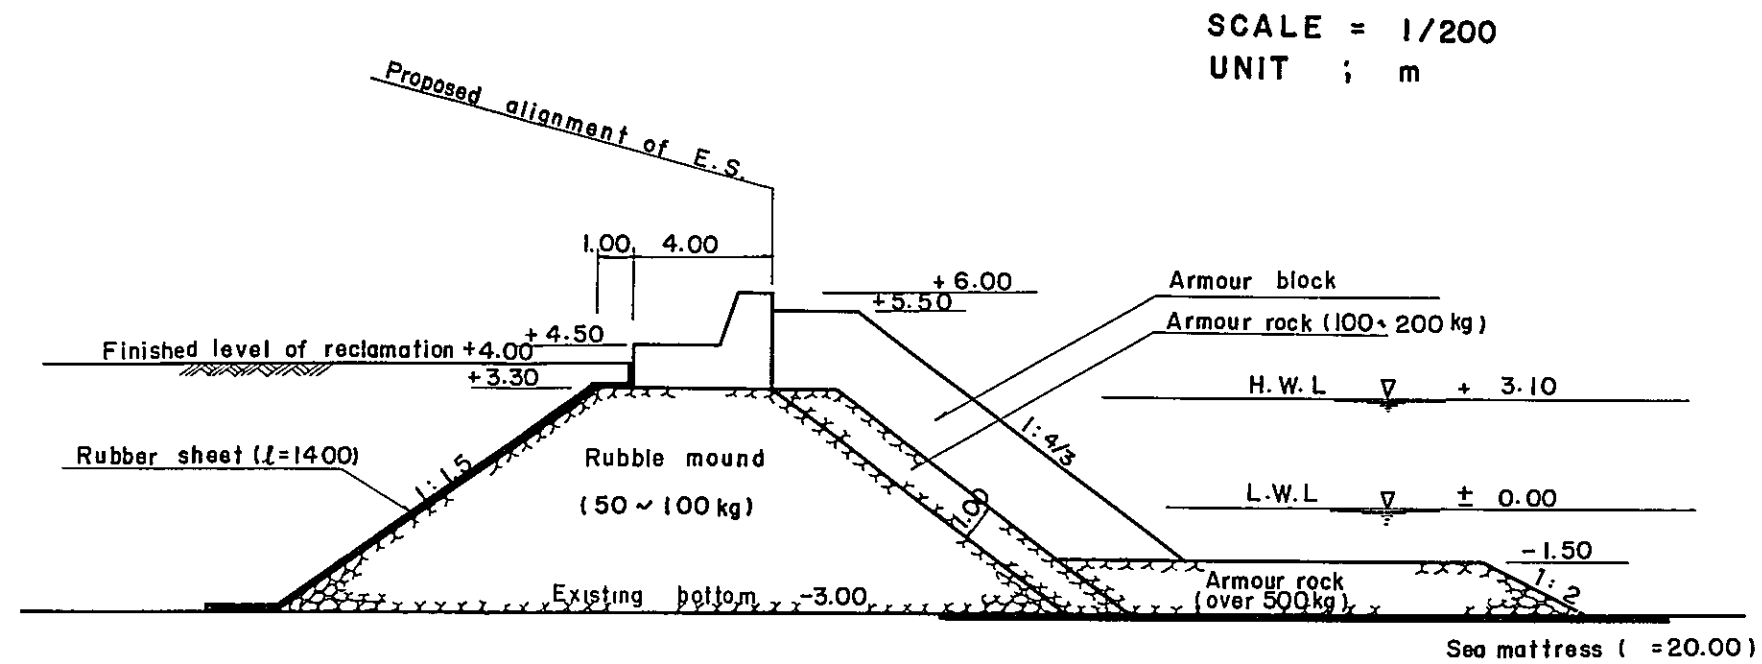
(c) STANDARD SECTION OF EAST BREAKWATER
